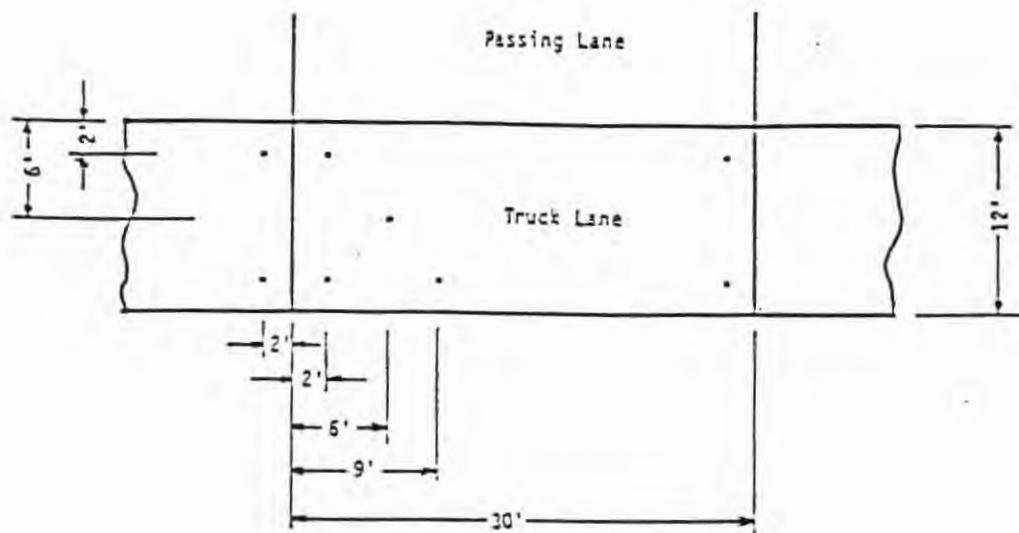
A Typical Hole Pattern Used in Undersealing Plain Concrete Pavements (18).
